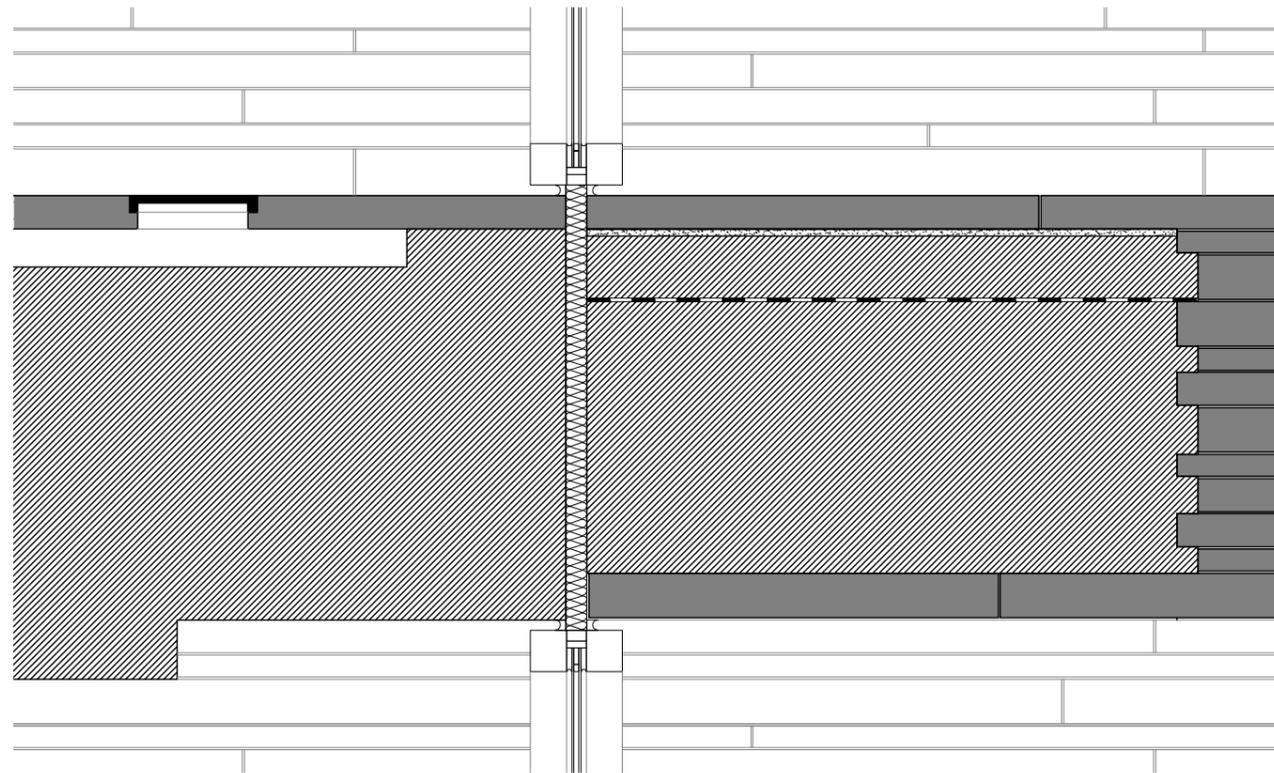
(Above): Drawing illustrating the assembly of the corner joints.
